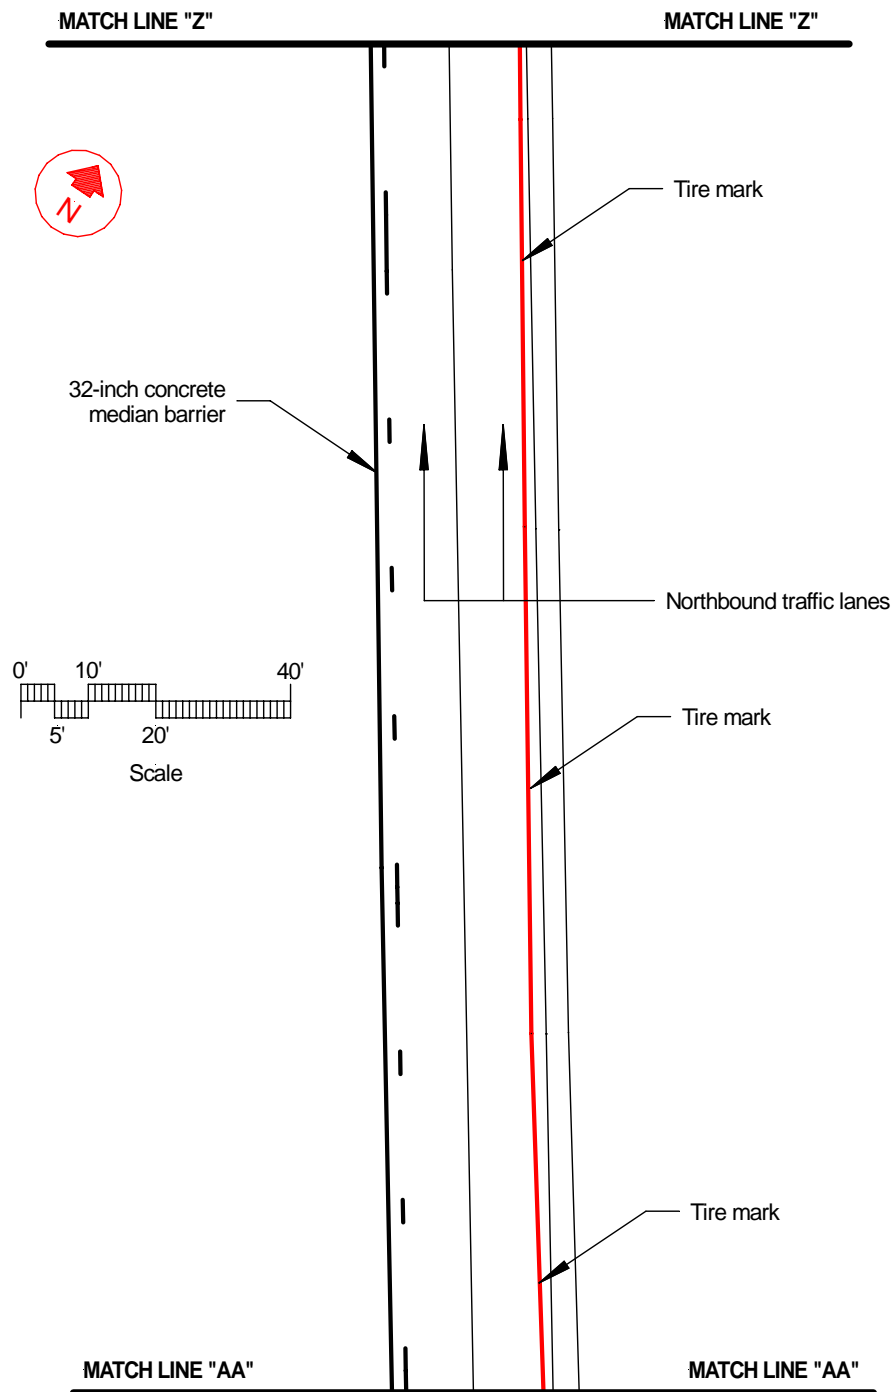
NTSB map of Z-AA pavement markings and roadway evidence.
